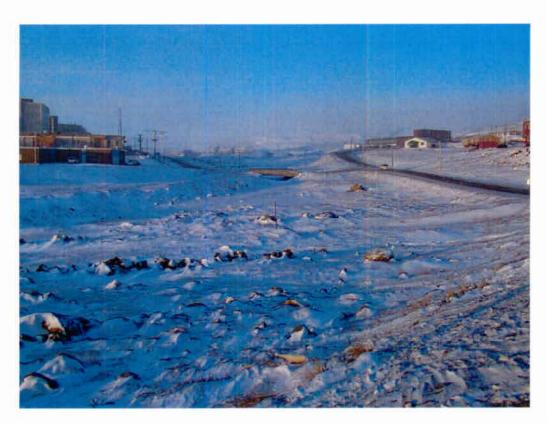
Looking upstream at Apex Road Crossing, Power Station in background. A second washout (#2) would be expected here.
